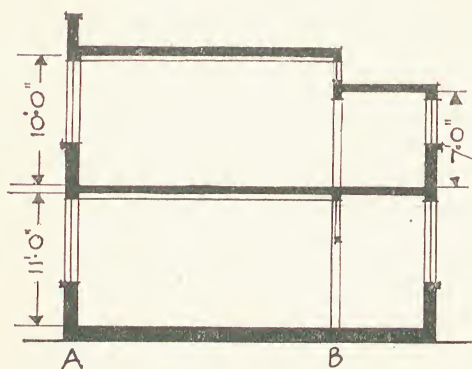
DIAGRAMMATIC SECTION SHOWING CEILING HEIGHT SUITABLE FOR ELEMENTARY AND SECONDARY SCHOOLS
